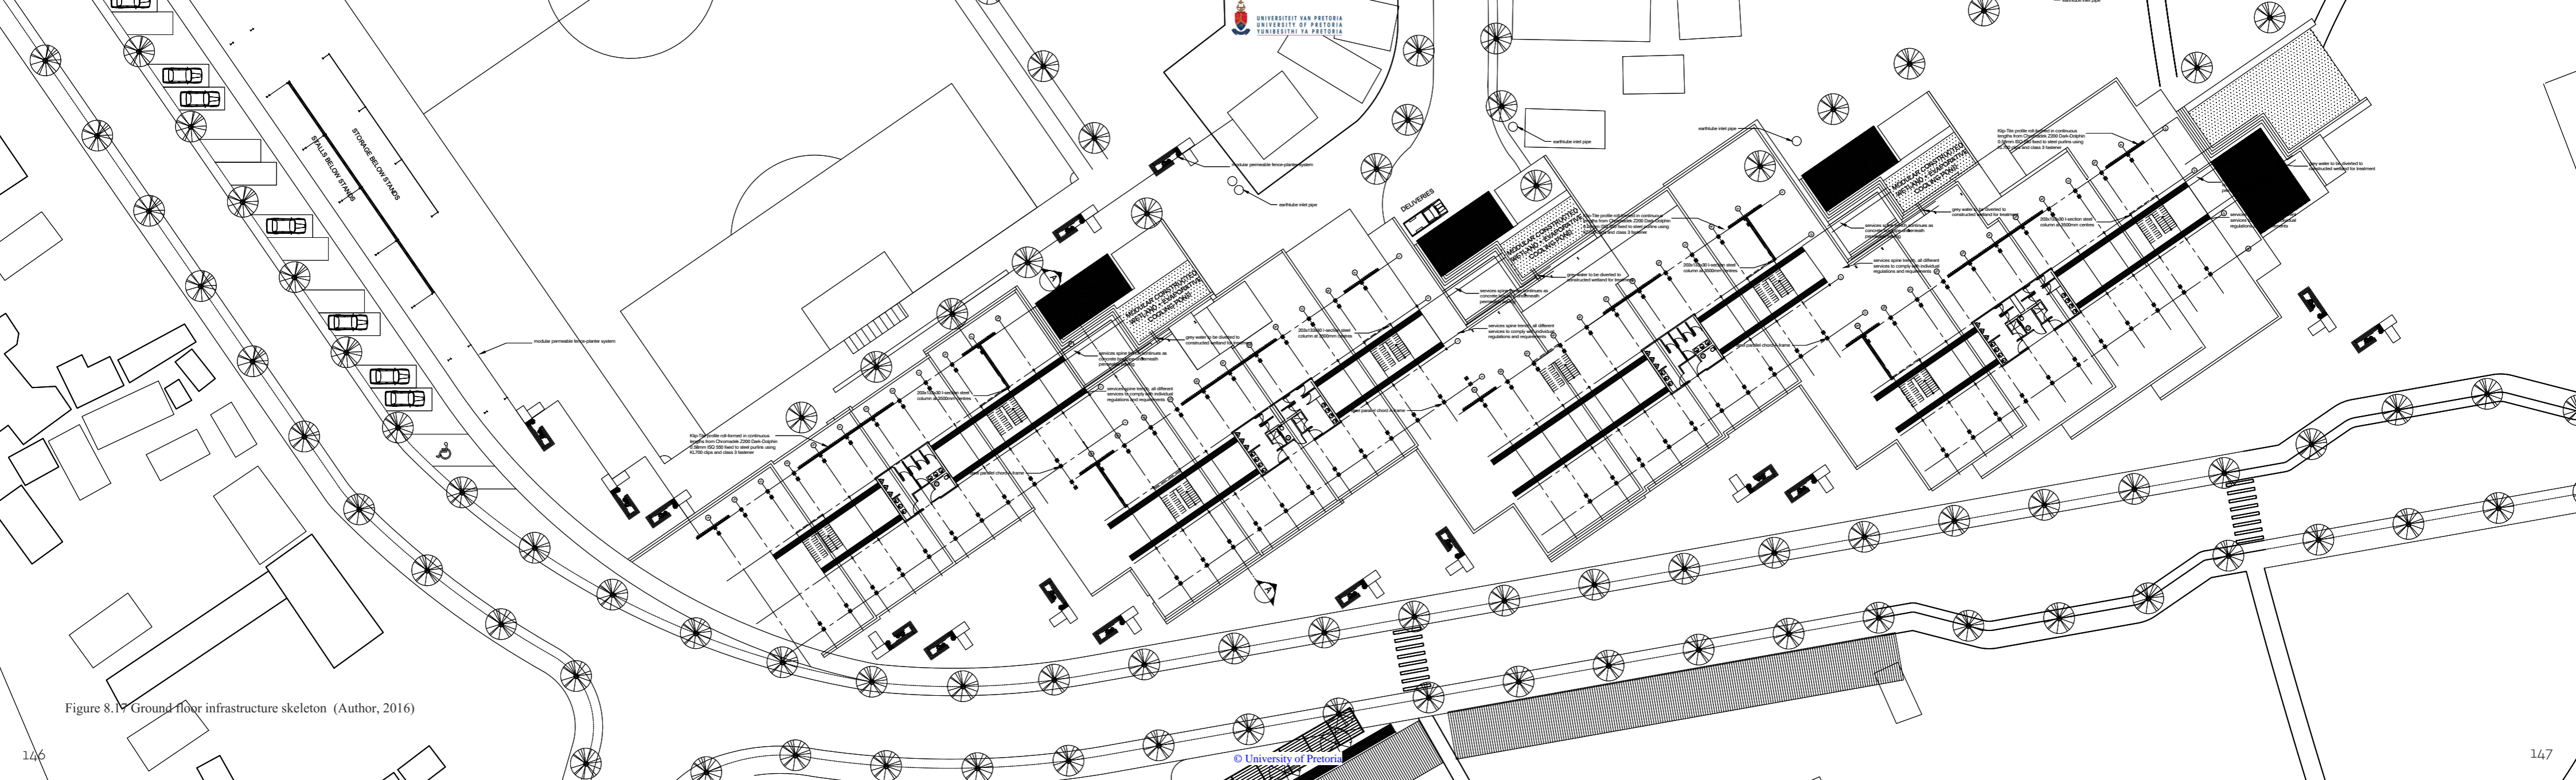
Ground floor infrastructure skeleton (Author, 2016)
